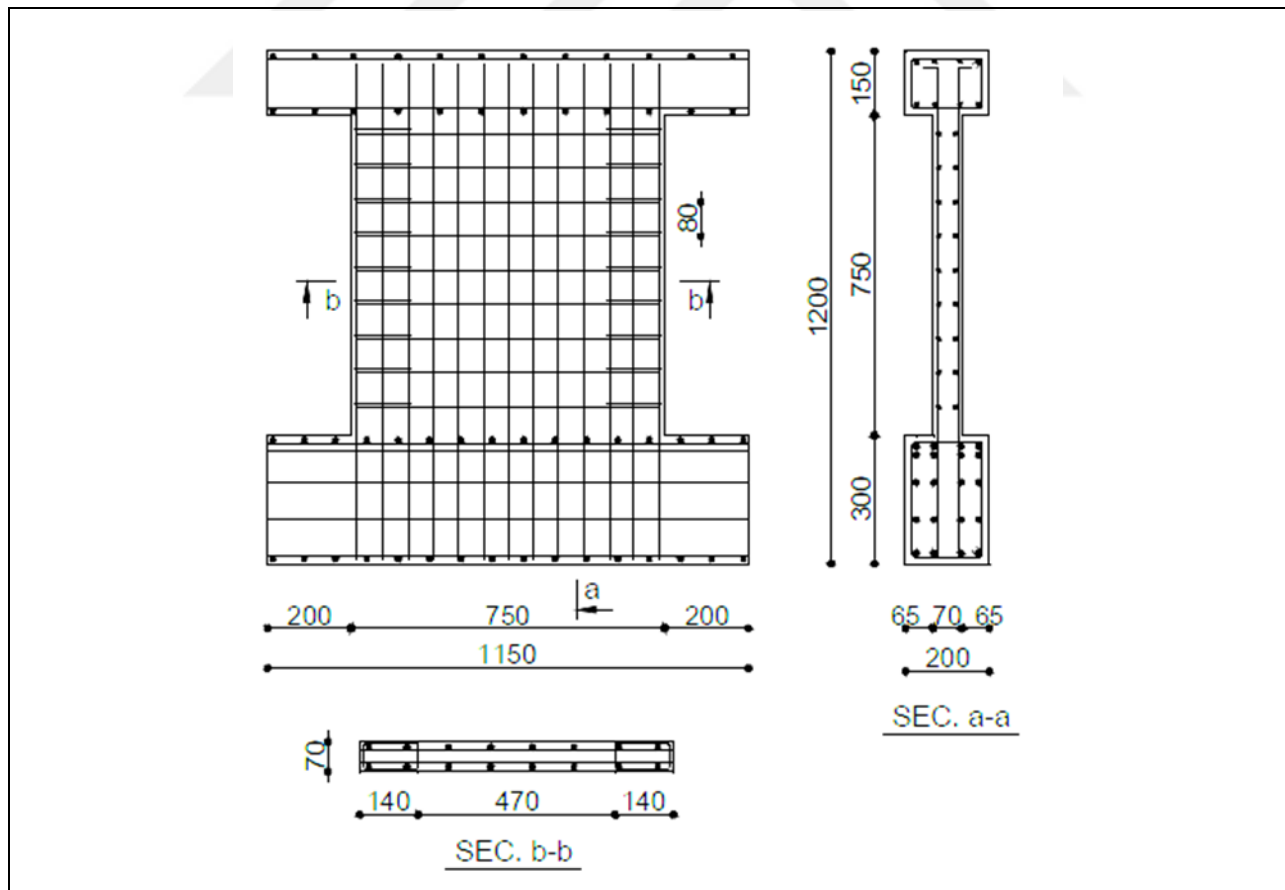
Rebar Details and Wall Dimensions (mm)[25].
